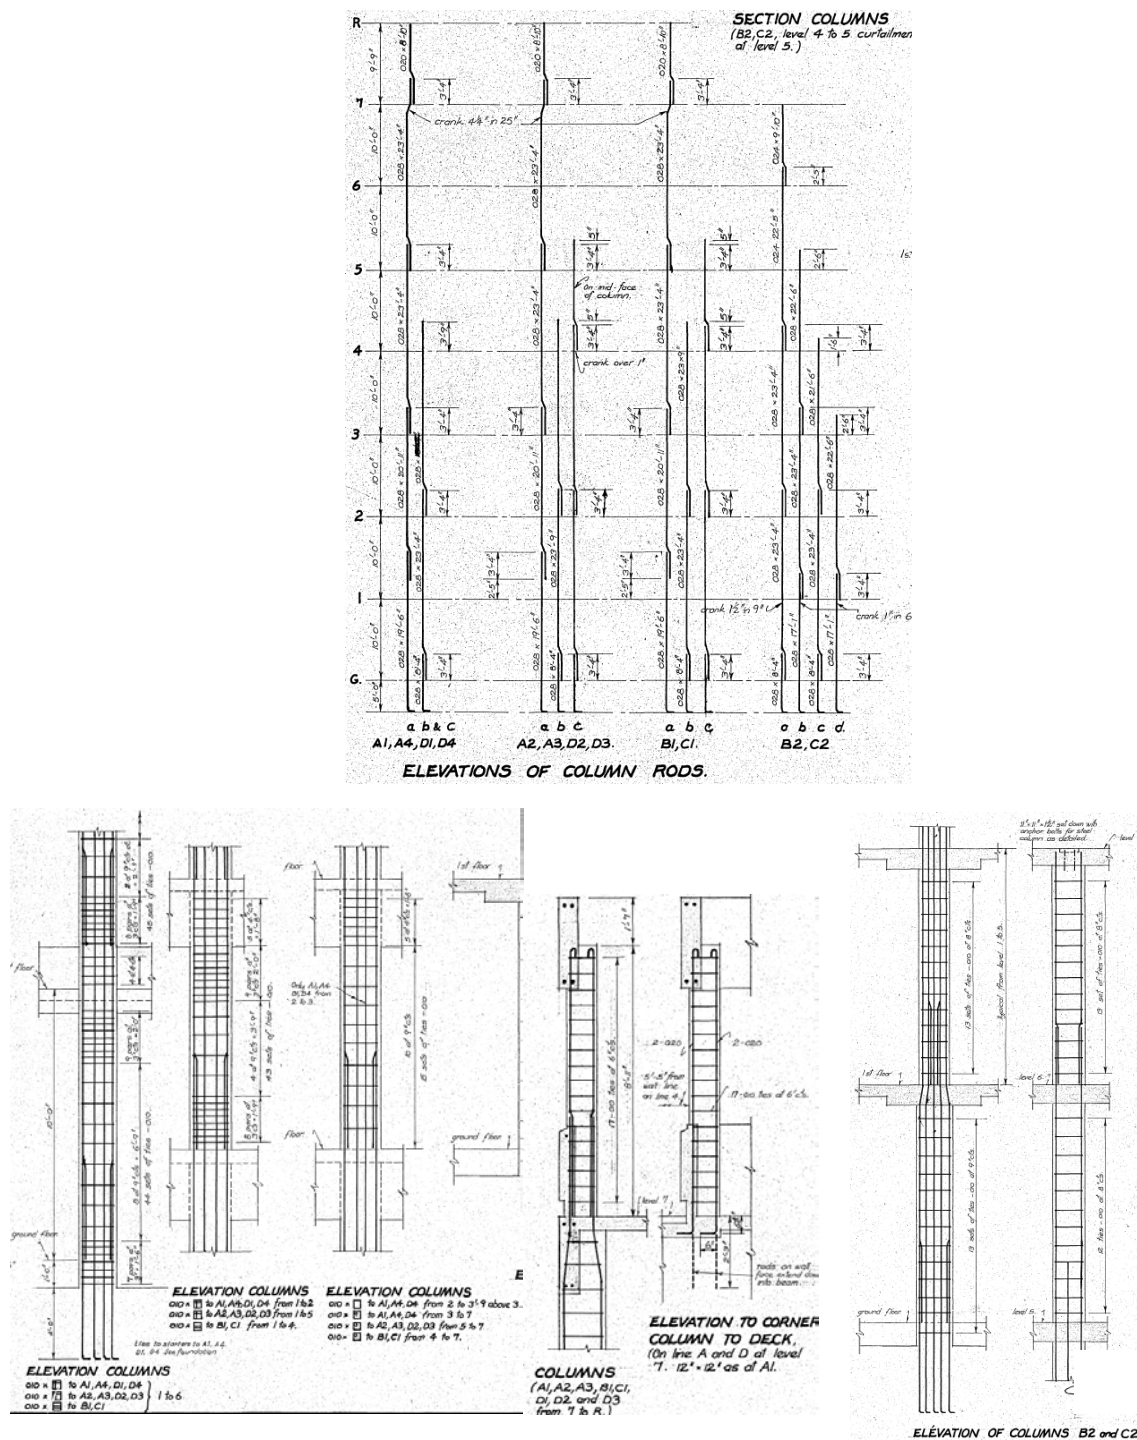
Elevation scheme of column reinforcements in Frame 1, A and D.
